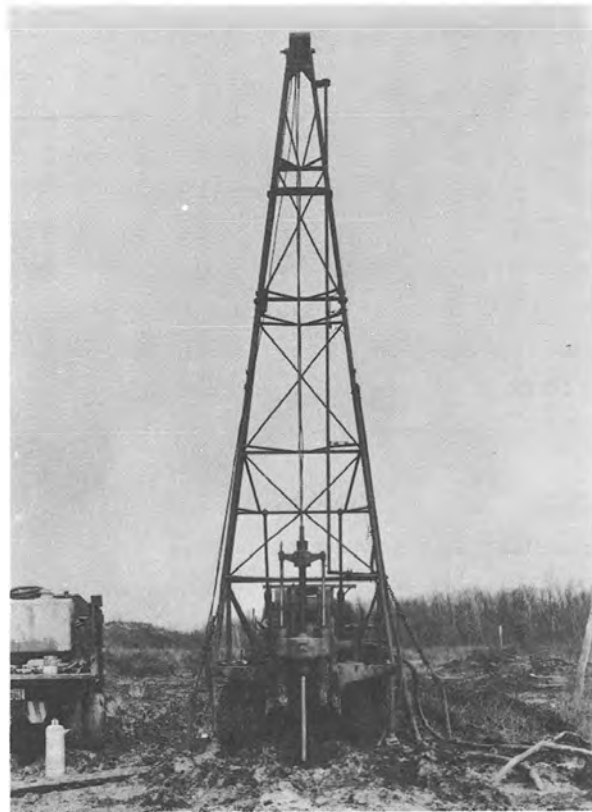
Waterways Experiment Station drill rig on typical boring location
